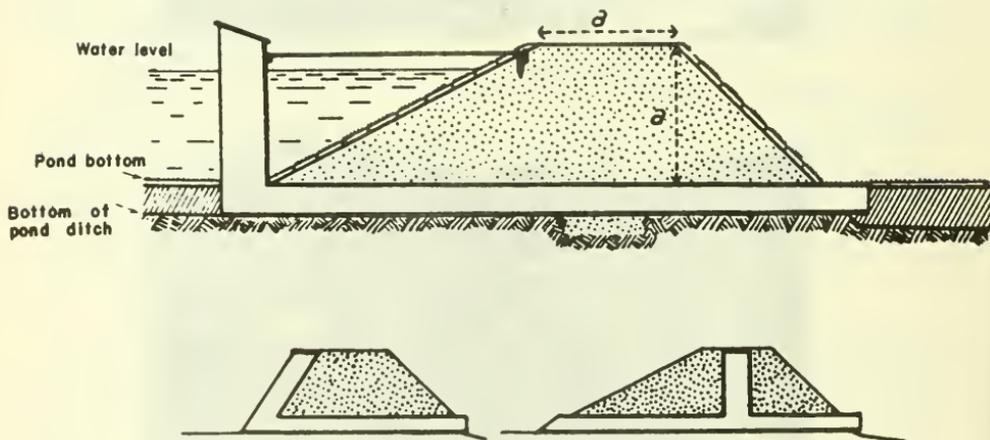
ABOVE: Cross section through a pond dam with suitable and correctly built-in sluice. BELOW: Two hardly suitable types of sluice installation. CROSSLINED: Natural ground; DOTTED: Filled ground.
